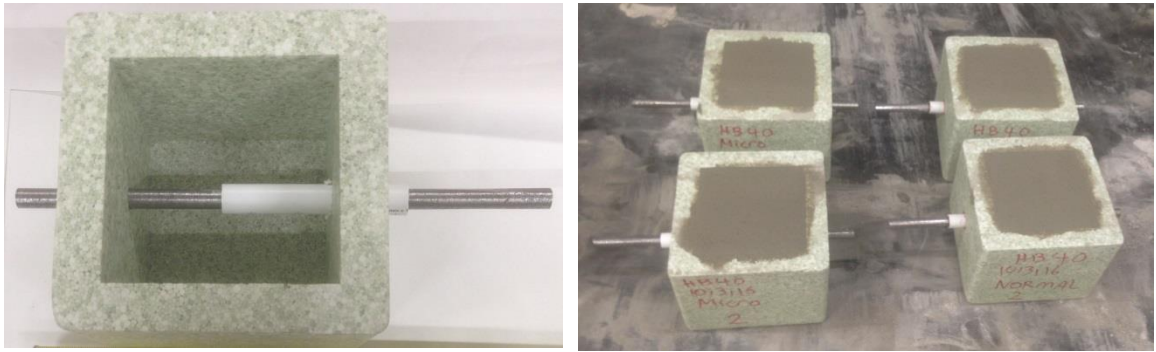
Preparation of the polystyrene mould for casting, (a) inserting a steel bar with sleeve and (b) four specimens after casting.
